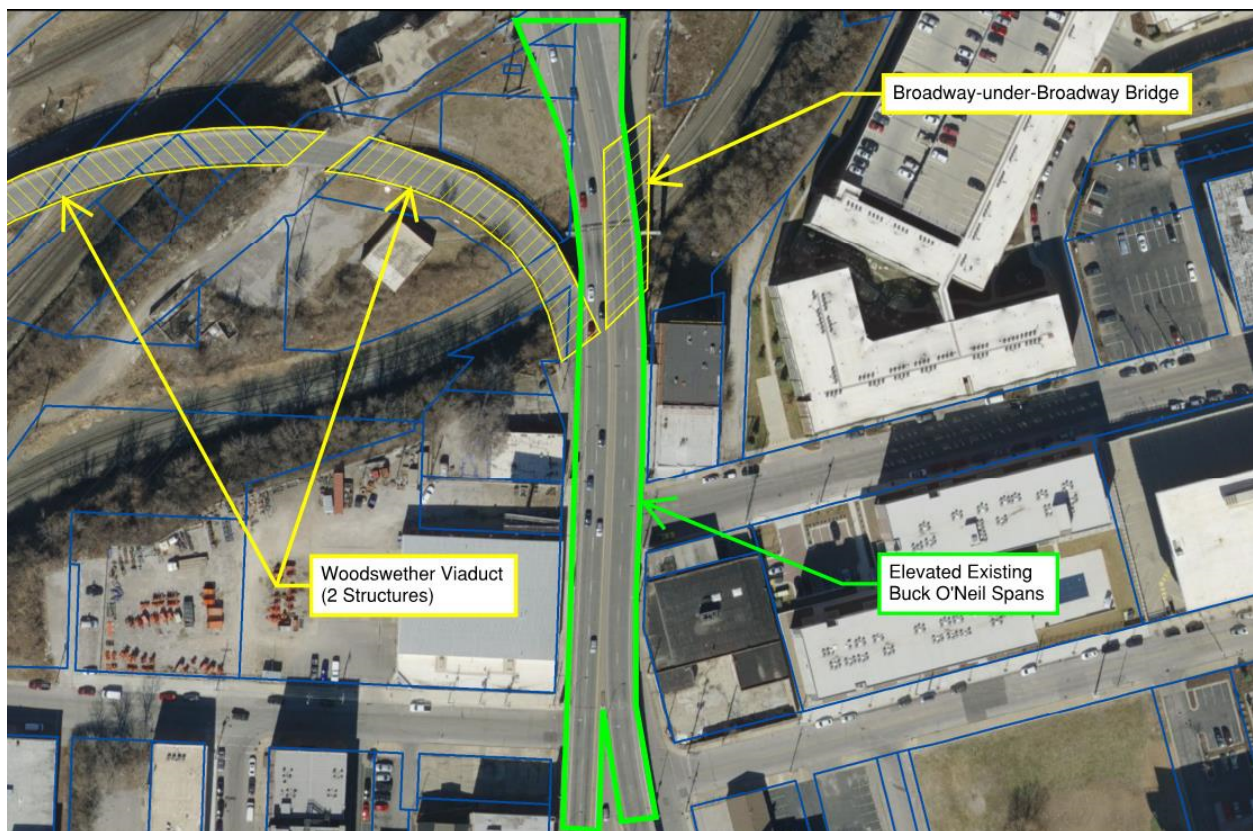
Existing Bridges to Remain in Place near Woodswether/West Bottoms Access
